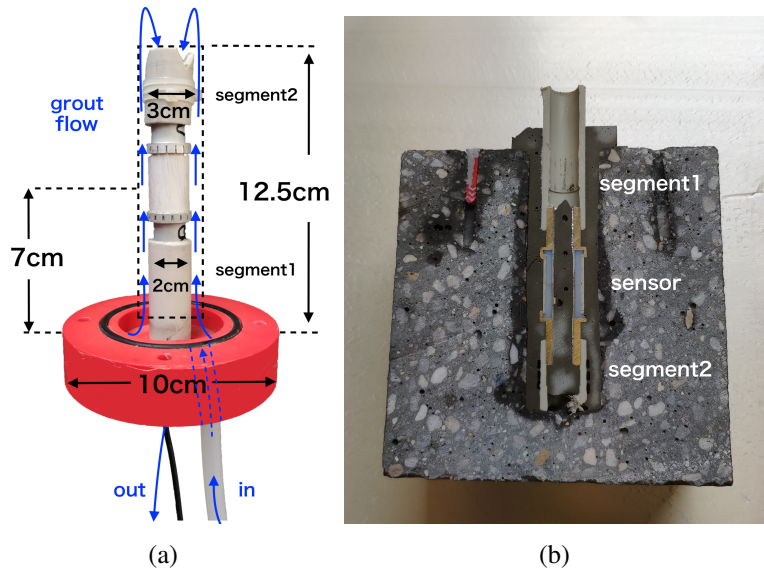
(a) Sensor module and grout flow; (b) Longitudinal section of the tested specimen
